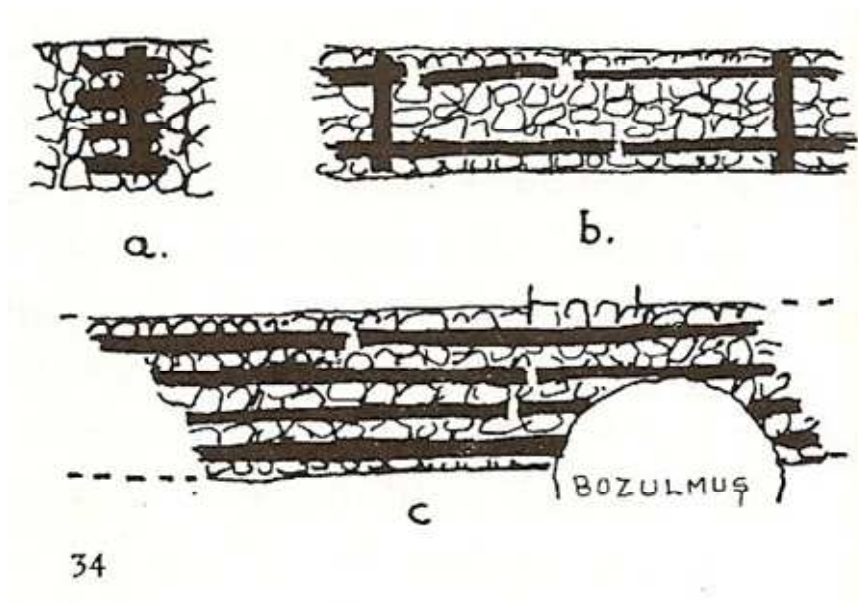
8 Plan of the wall construction of Beycesultan(Naumann, R. 1985)
